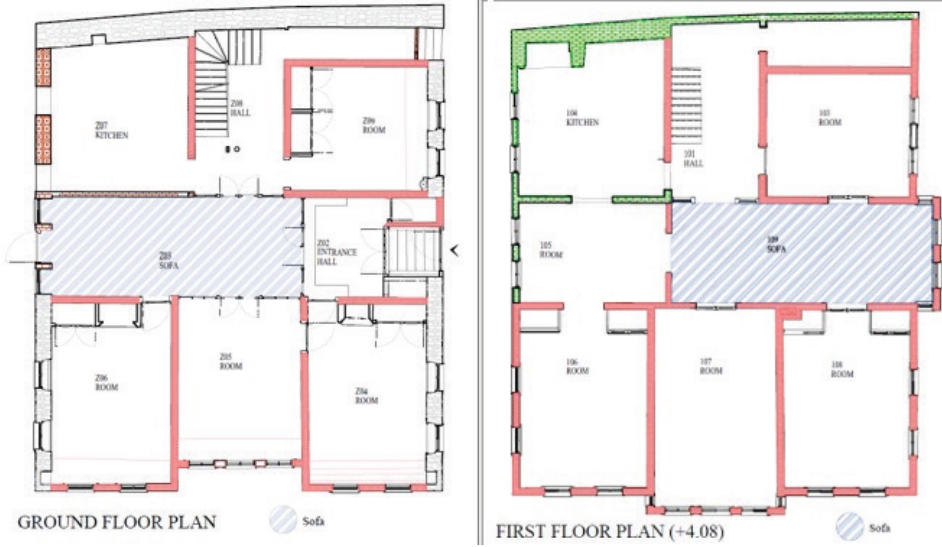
Ground floor and 1st floor plan schemes of the building. (Drawn by using Nazlı Keçeci's drawings, 2020)
